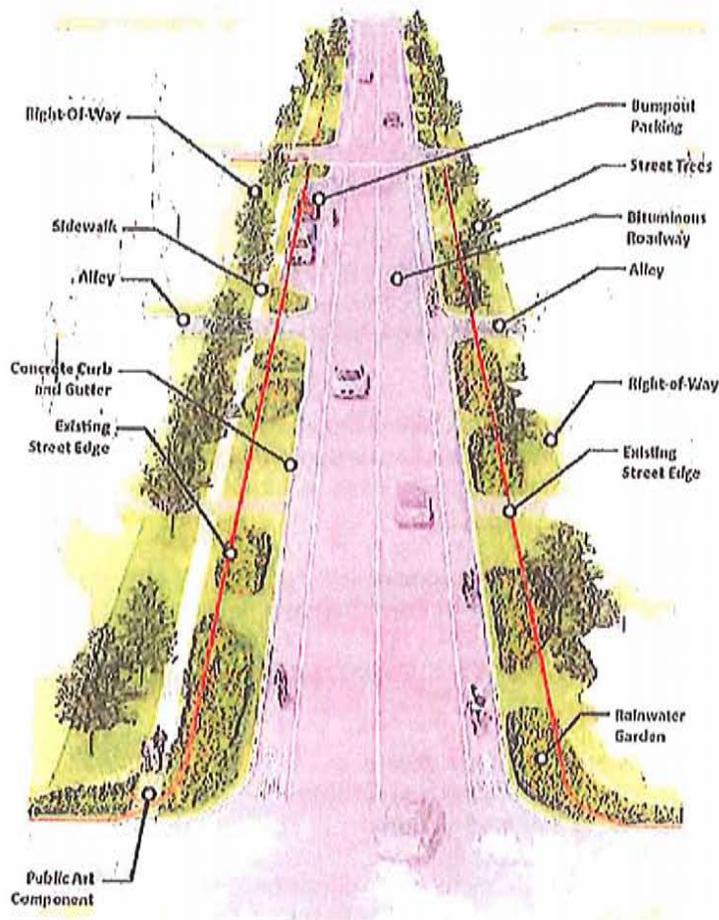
COLLECTOR STREET - RWMWD/BARR REPORT
